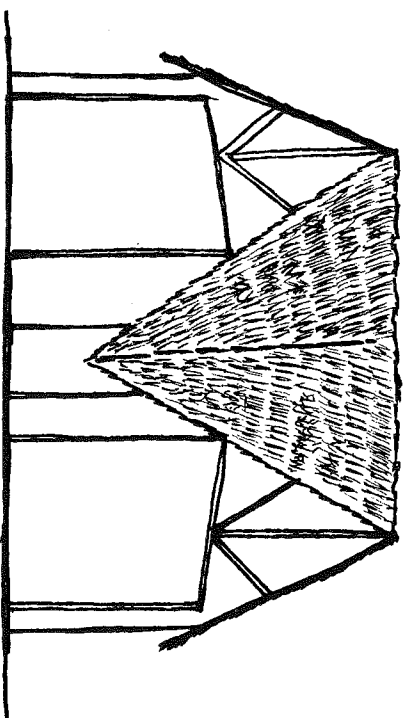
An Example of Roof Construction That Does Not Require Guttering.
